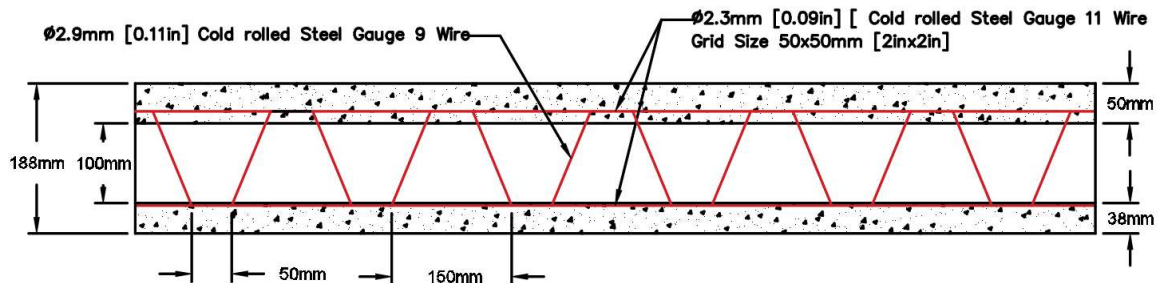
"Diagonal-CSP" Side View and Dimensions
